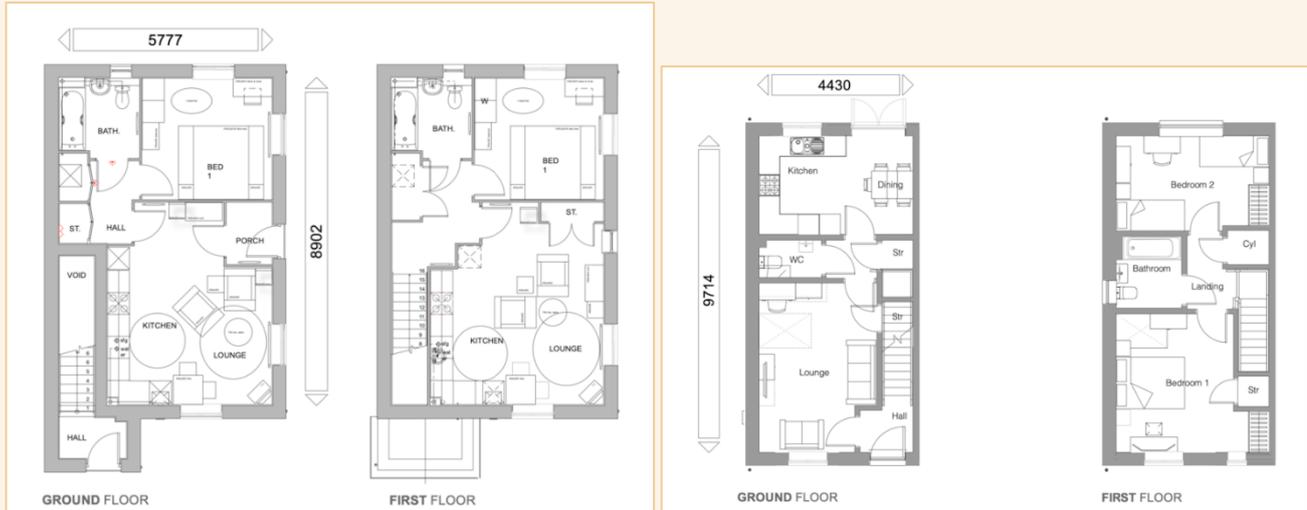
Plan drawings of the 1B2P(left) and the 2B4P (right)
